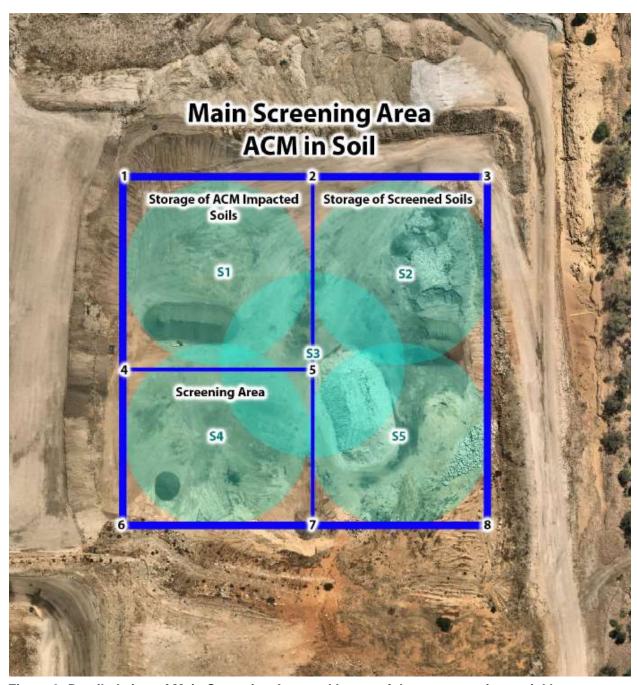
Detailed view of Main Screening Area and layout of dust suppression sprinklers.
